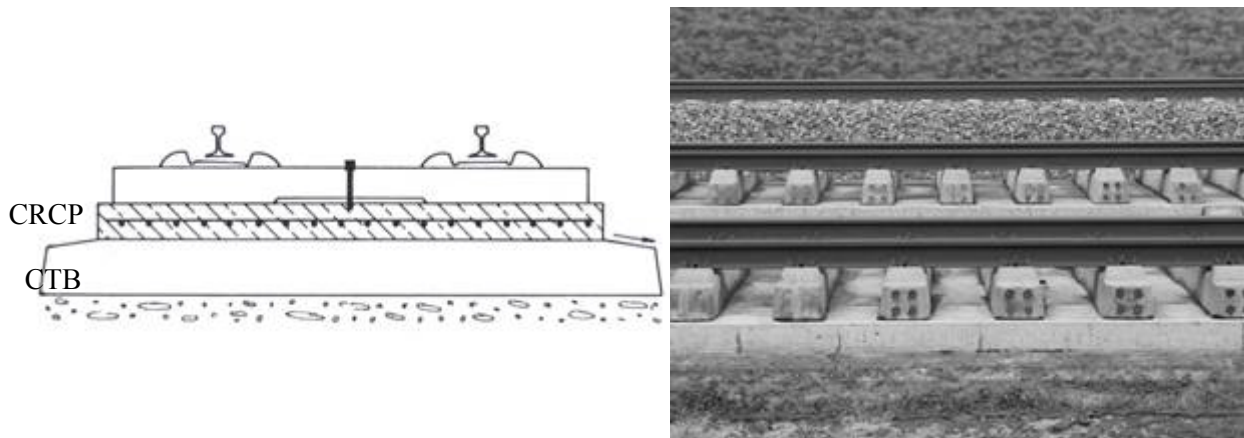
Line Hannover – Berlin opened 1998; Track systems “BTD - V 2” using steel anchor bars for longitudinal and transversal fixation of the sleeper panel.
